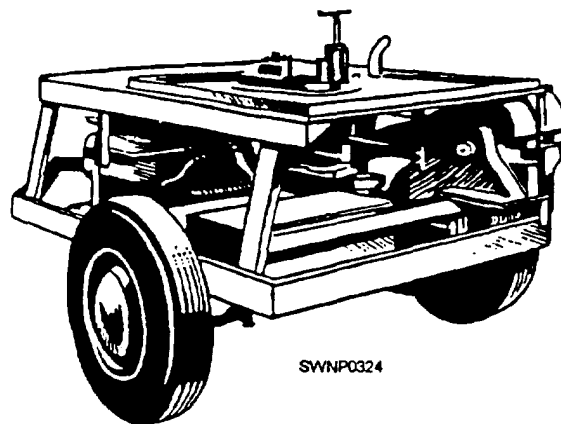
Ironmaster portable hydraulic bender and shear.
